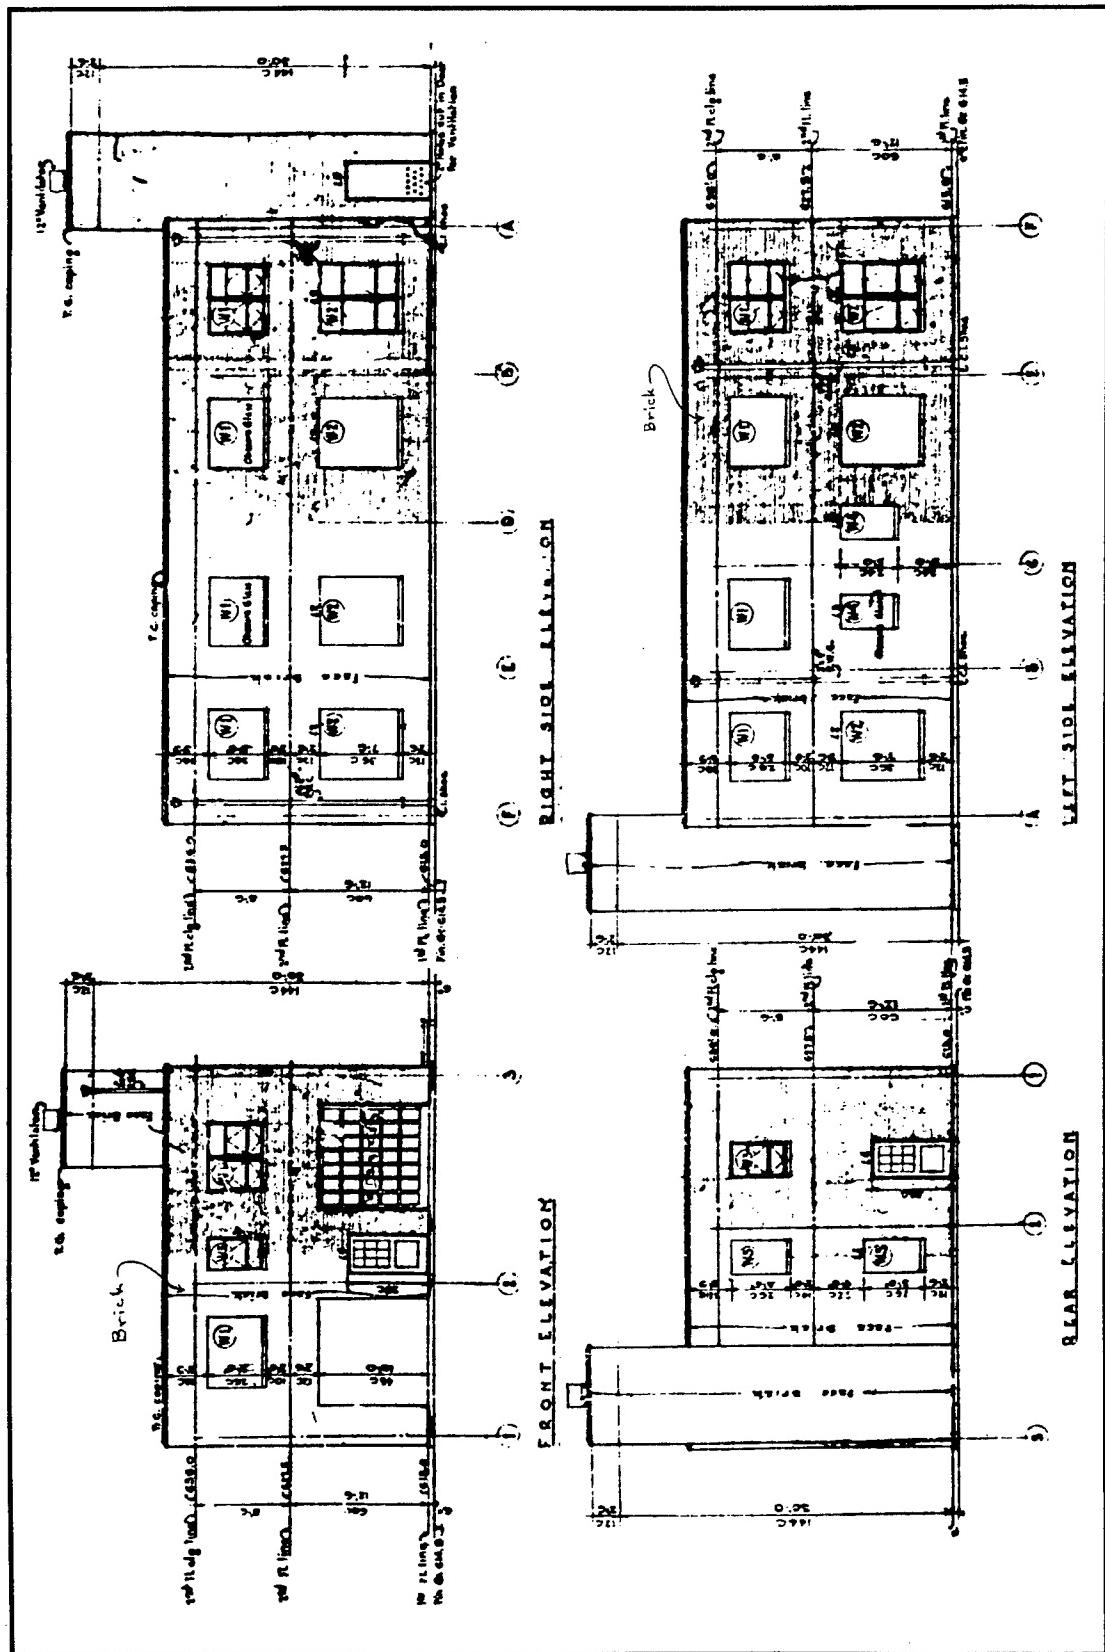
Elevations, Fire Headquarters (Building 709-A), Indiana Ordnance Works Plant 1 (INAAP Drawing V-45944).
